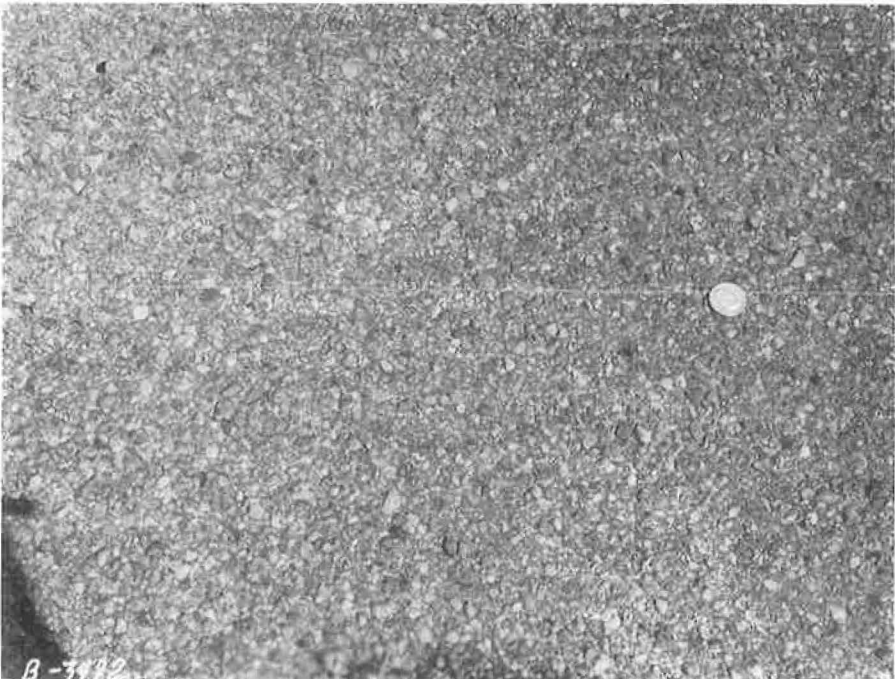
Type F Grade 4 coverstone 3 months after construction FM 744.
